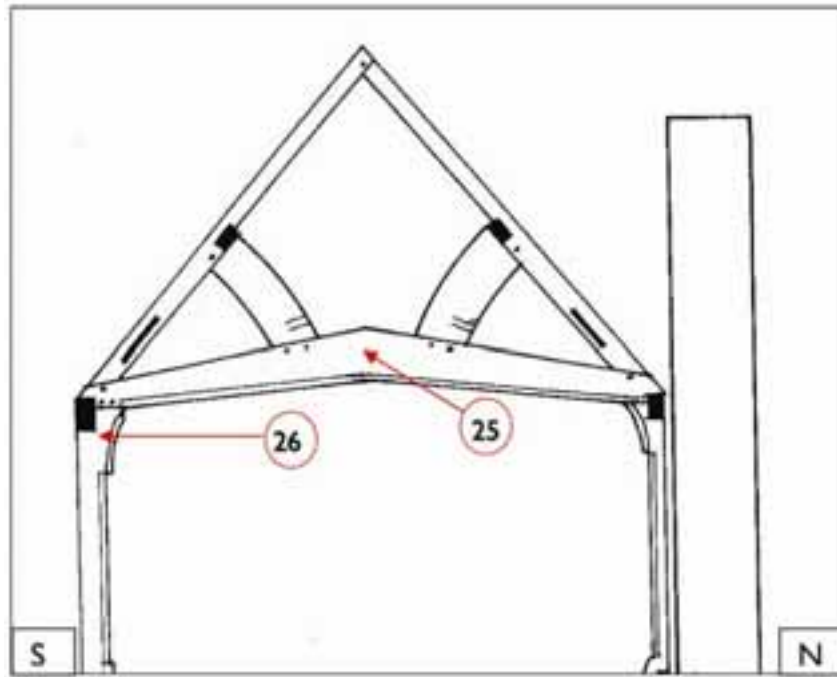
South cross-wing truss 3 showing sample locations, viewed from the east looking west (based on a drawing provided by N Hill)
